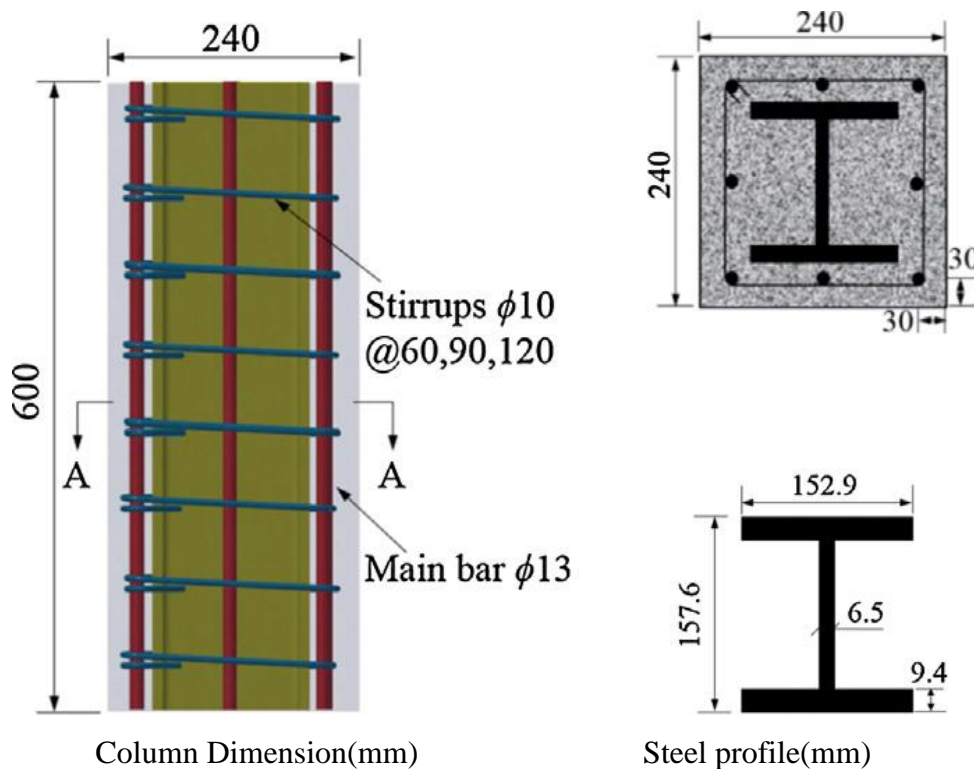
1: Dimensions Details of test specimens(Lai, Liew and Xiong, 2019)
